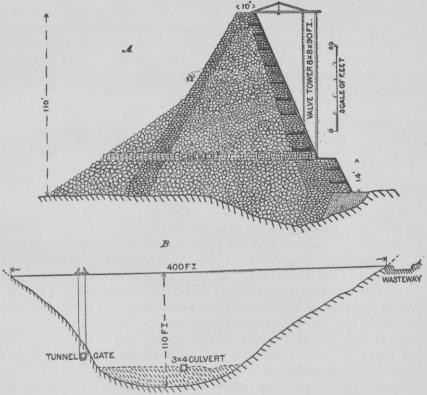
Cross section and elevation of Walnut Grove dam.
